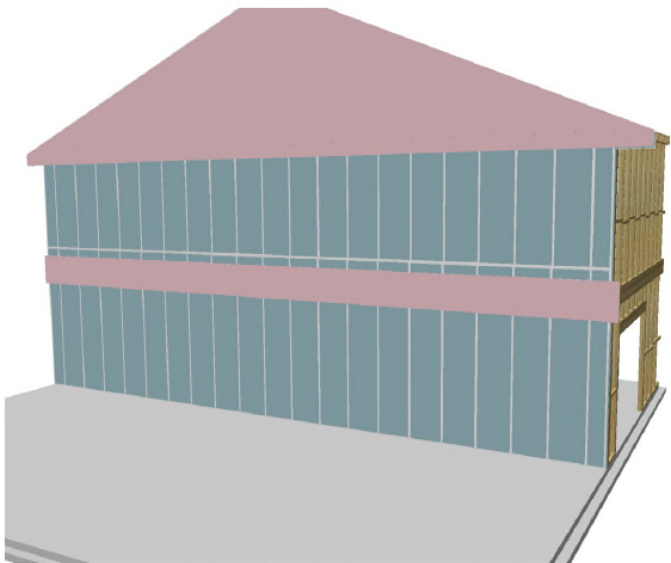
Laminate 16mm Fireshield to Central Fire Barrier
